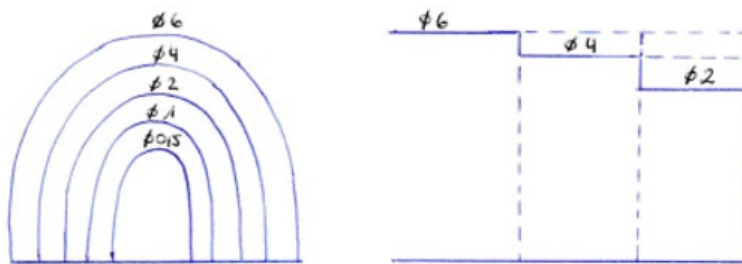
Concept blasting tests from the large to the small; view (left); section of the cut of the advance length (right)
